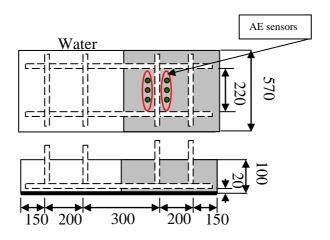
Rebars and Acoustic Emission Sensors Arrangement in Concrete Specimen.
